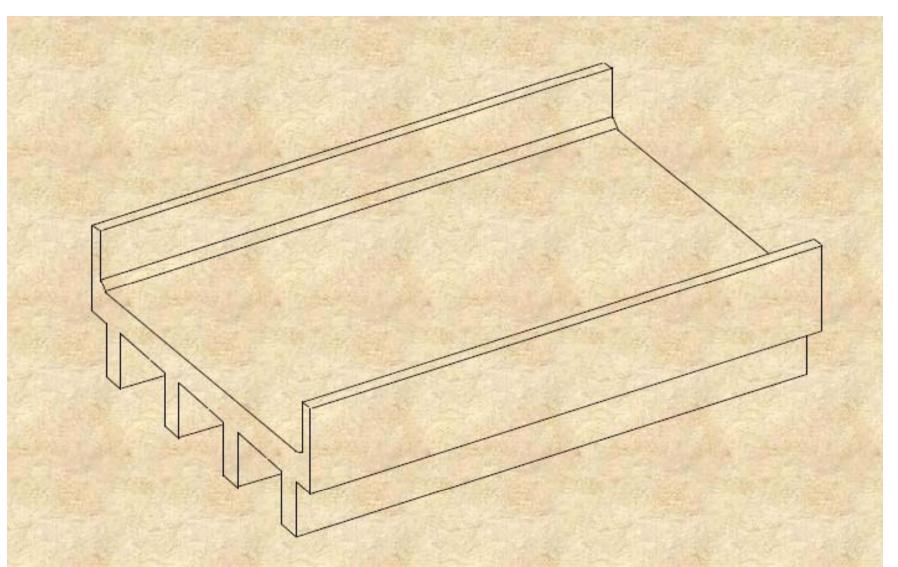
Typical Deck with Longitudinal Reinforced Concrete Beams.
